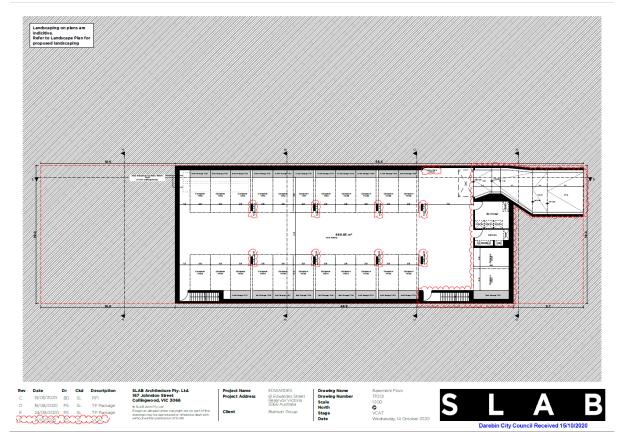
Substituted plans - Basement with vehicular access to Edwardes Street
